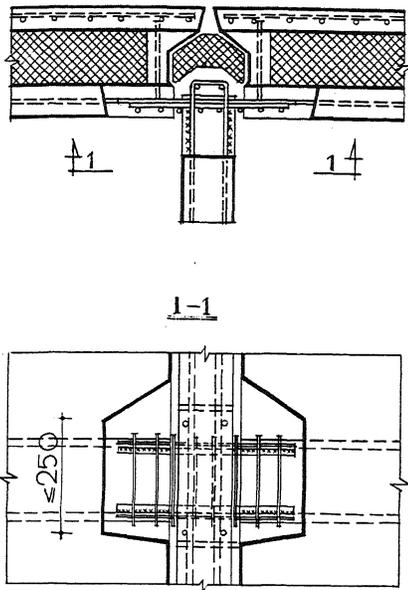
JOINTS ON WELDING OF REINFORCEMENT EDGES
